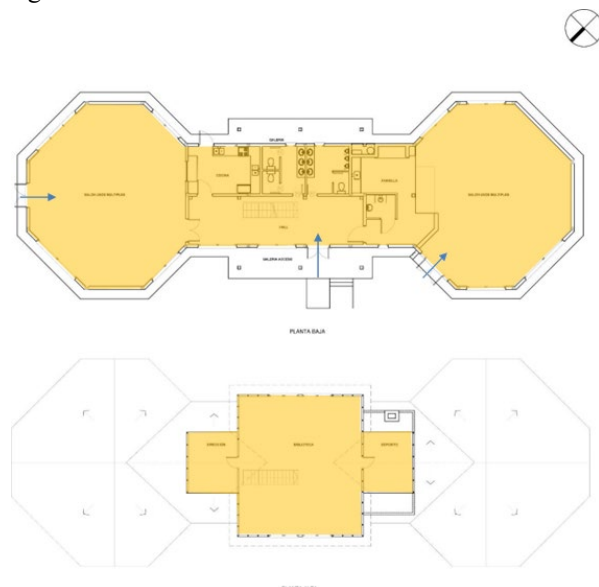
Floor plan (Source: Julián Basualdo Rapetti and María Belén Birche)
